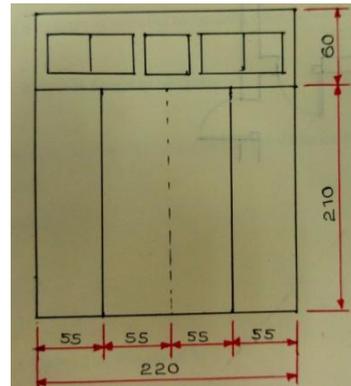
The front door dimensions of Pattivilla Walawwa (dimensions in cm)
